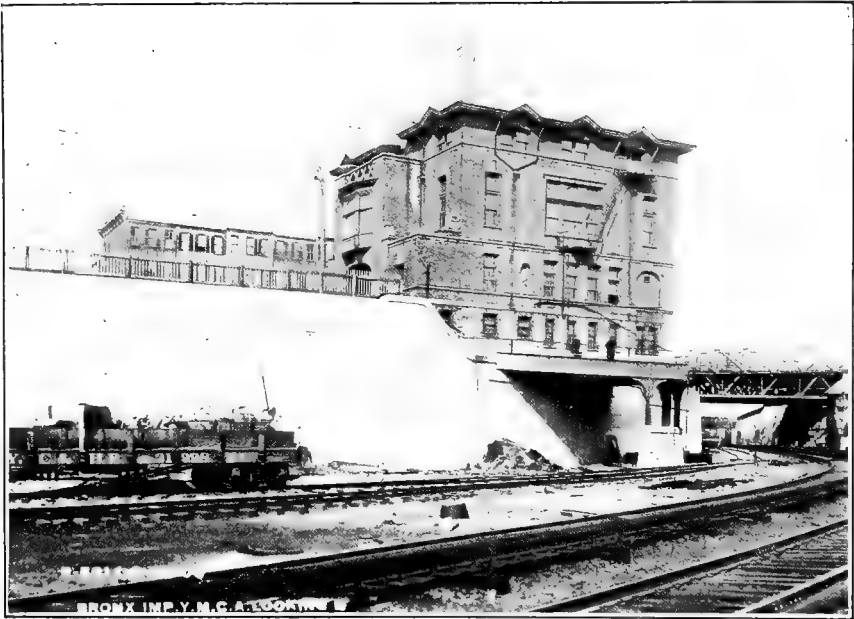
RETAINING WALL AND PROTECTION PIER, BRONX IMP., N. Y. C. & H. R. R. R.
